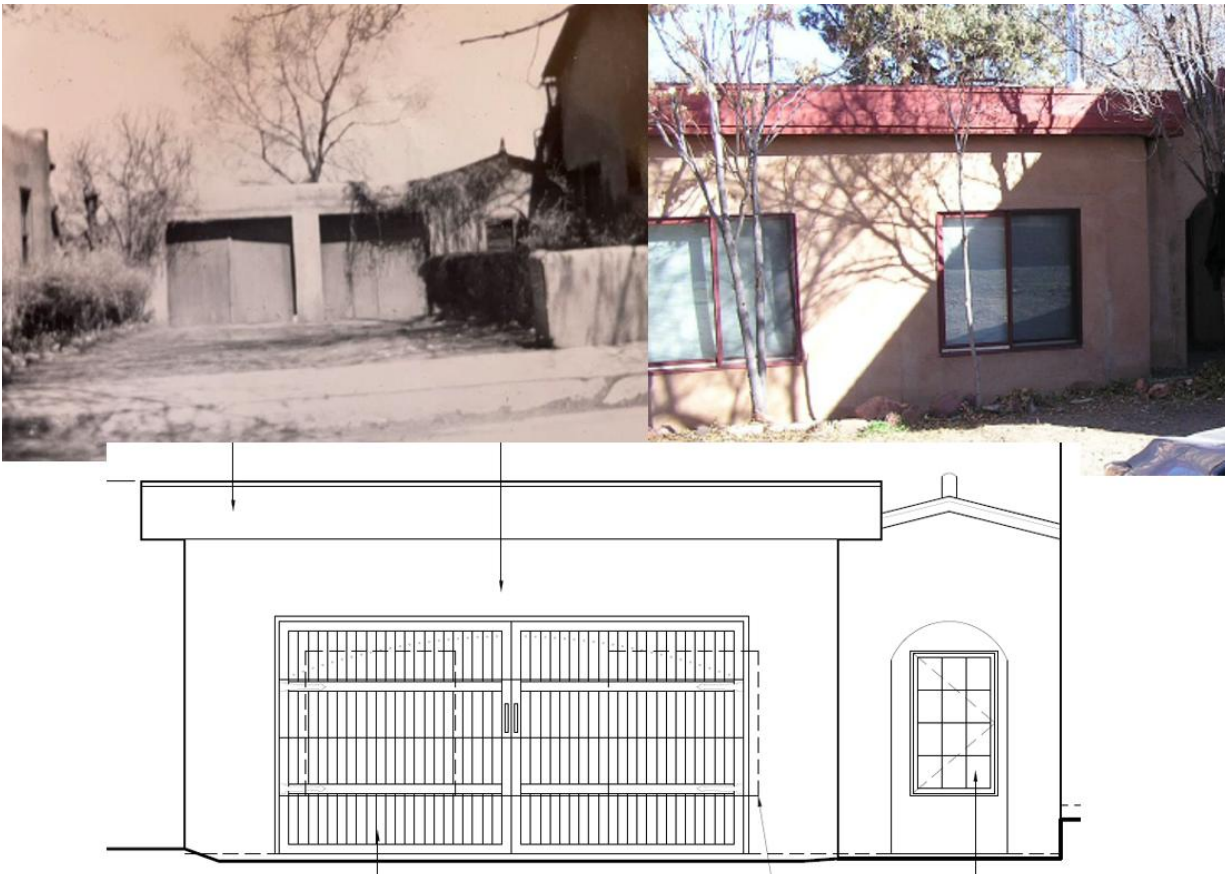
The Historic Openings, Current Openings, and Planned Opening
